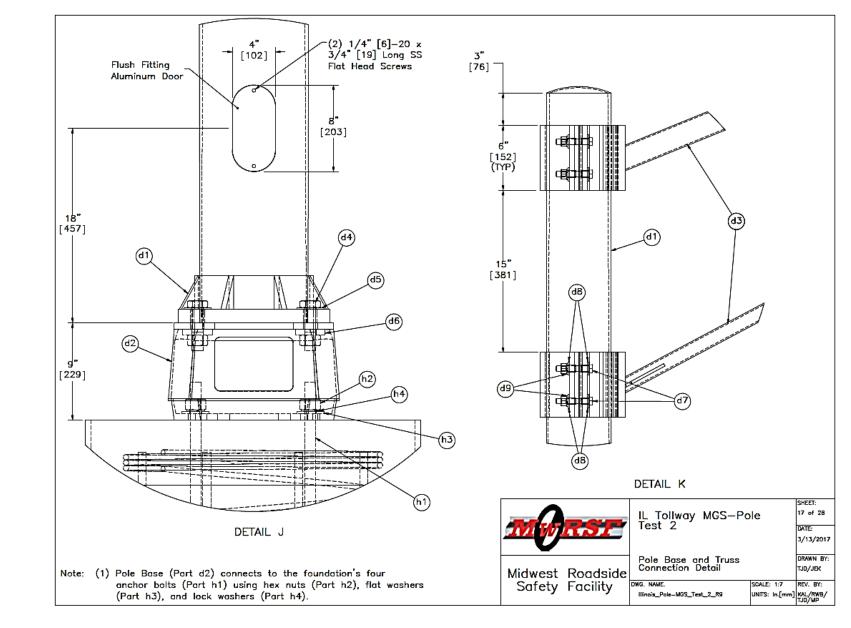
Pole Base and Truss Connection Detail, Test No. ILT-2
